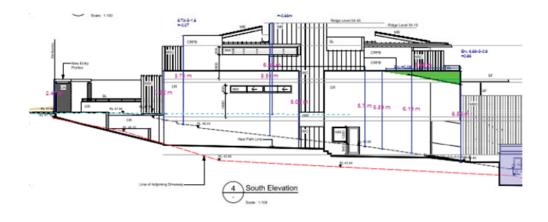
Southern elevation highlighting side boundary envelope and wall height noncompliance DA2017/1203
